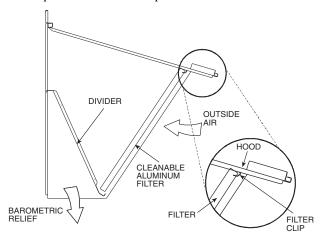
Economizer Filter Installation (Size 16 Shown)
